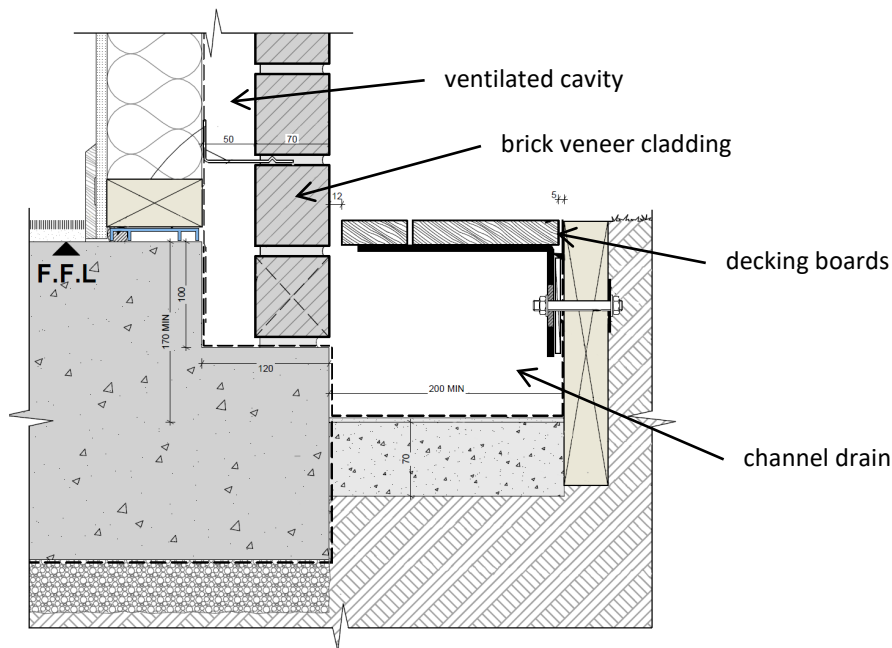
Detail for the proposed channel drain adjacent to brick veneer cladding.⁵
